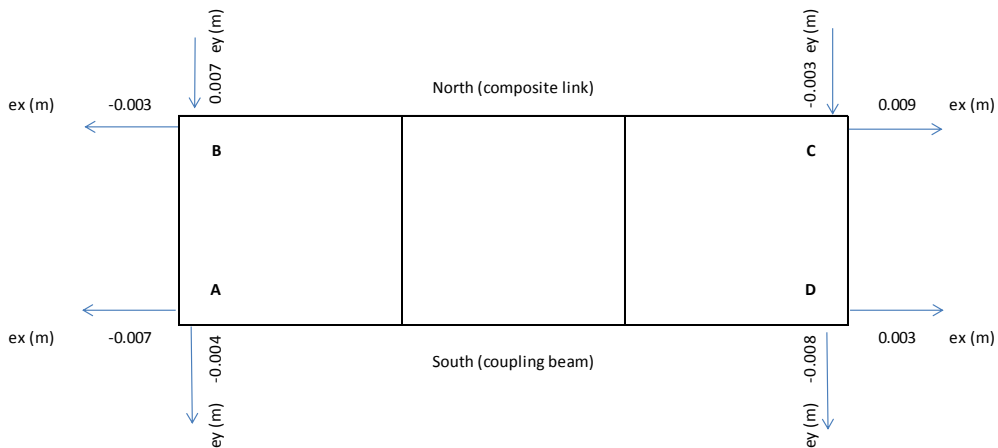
Out of plumb, 3rd measurement, 1st floor
